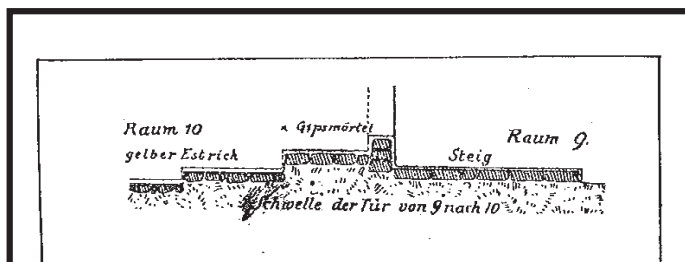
Cross section showing the foundation (scale 1:40) [27].
